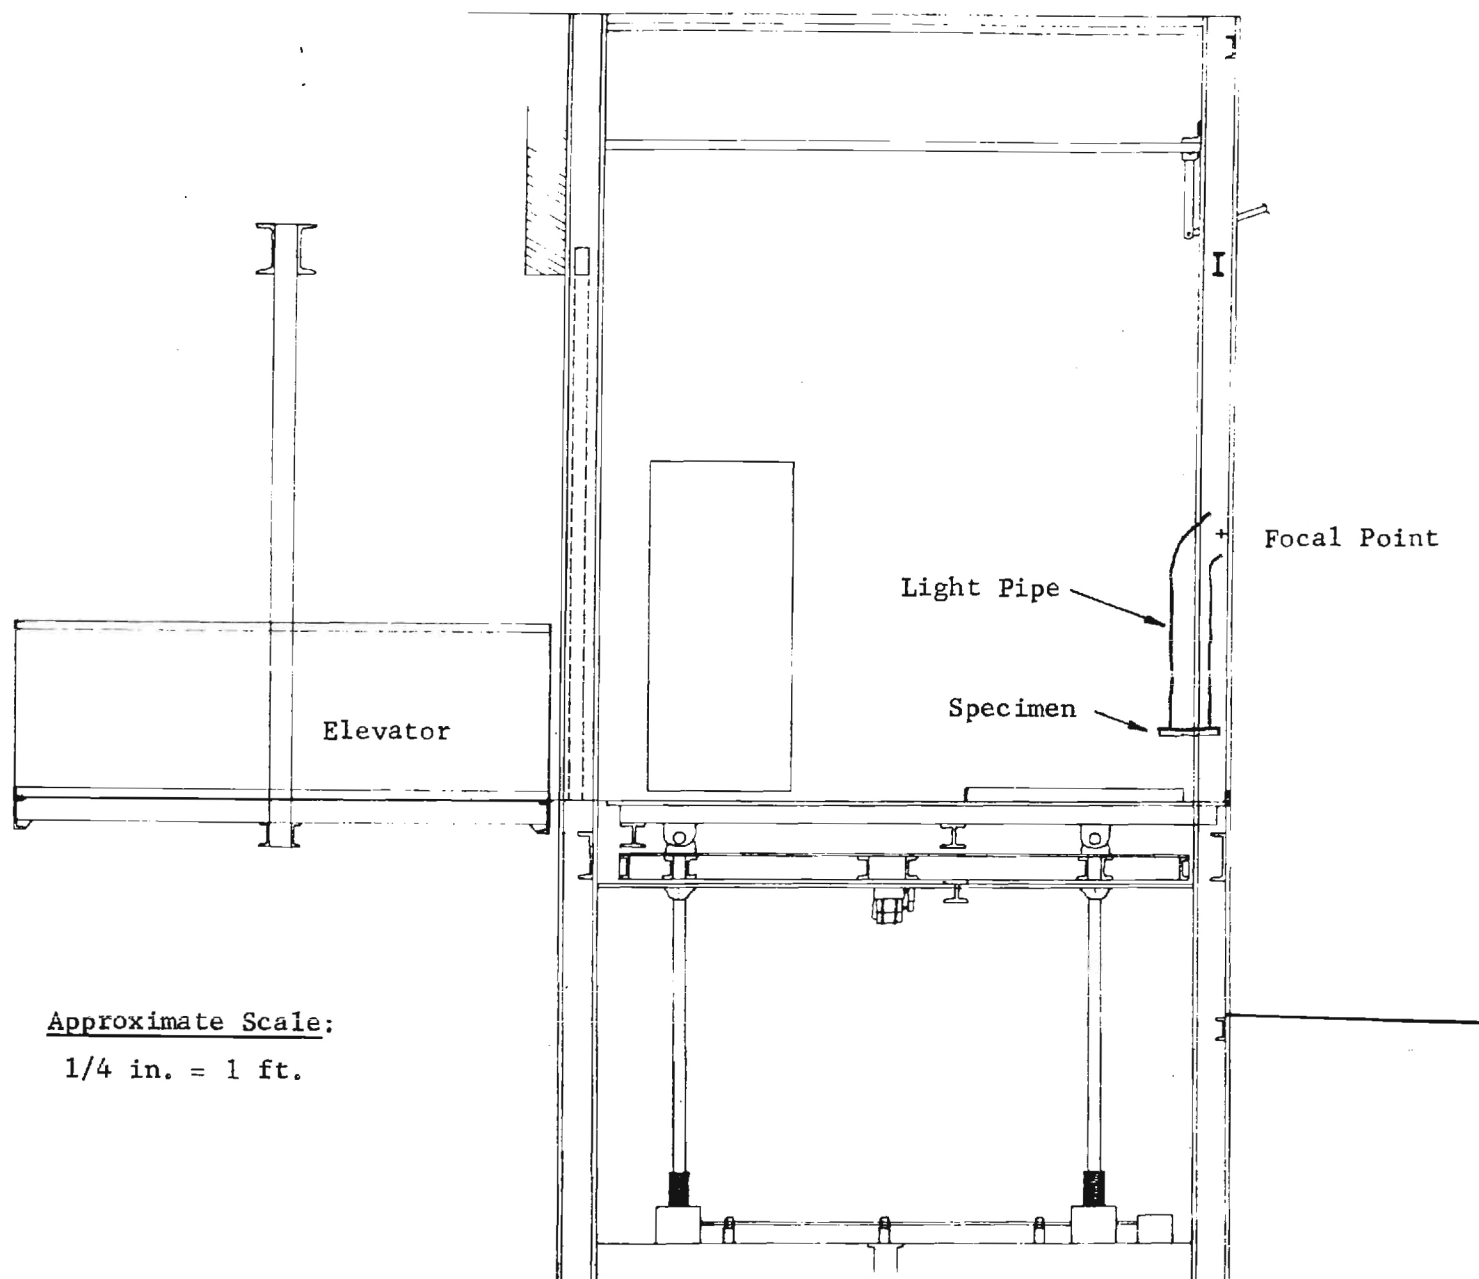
West side elevation of focal building at CNRS Solar Furnace.
